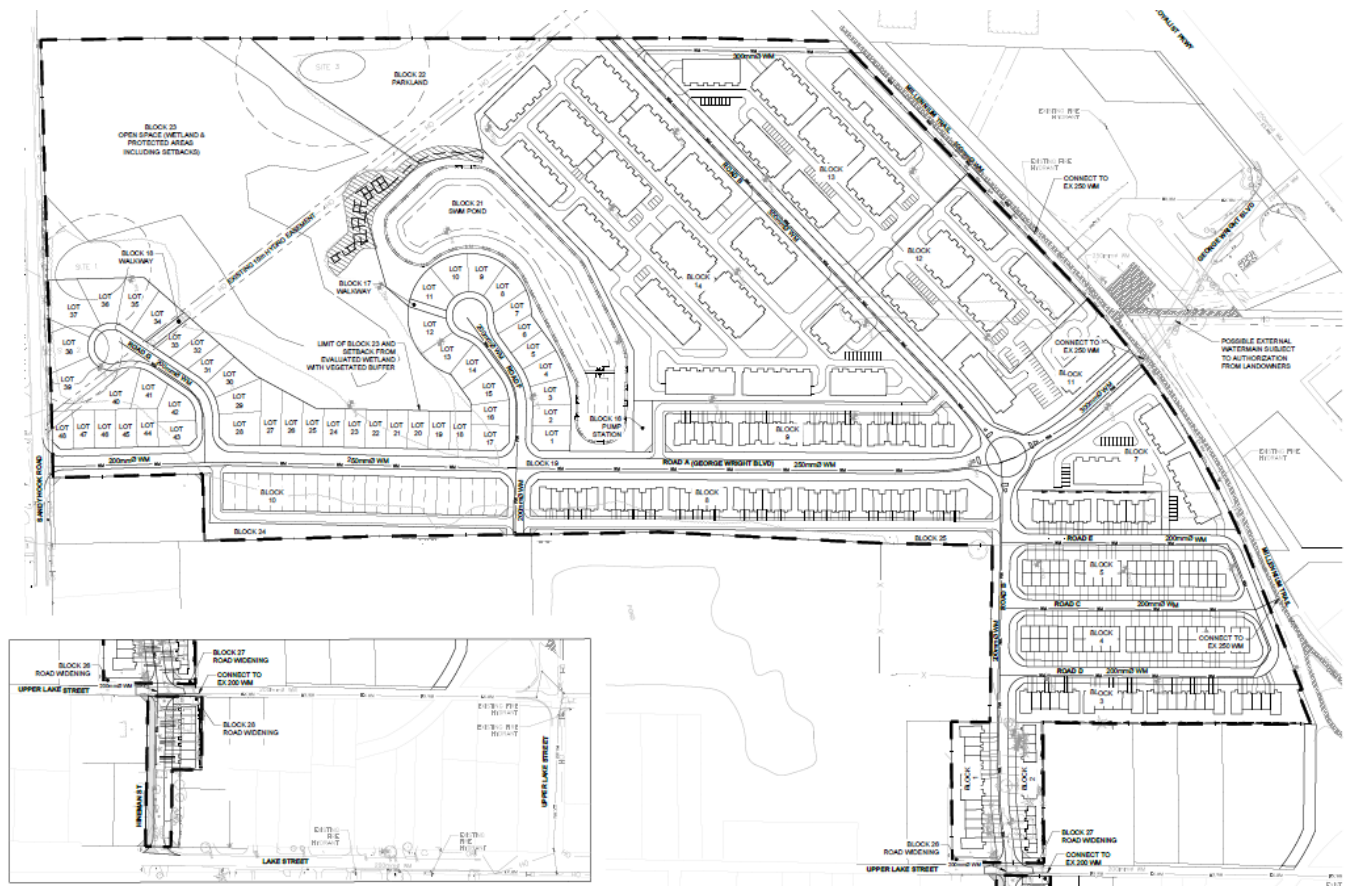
Preliminary Watermain Layout (Source: Insite Project Consulting Inc.)
